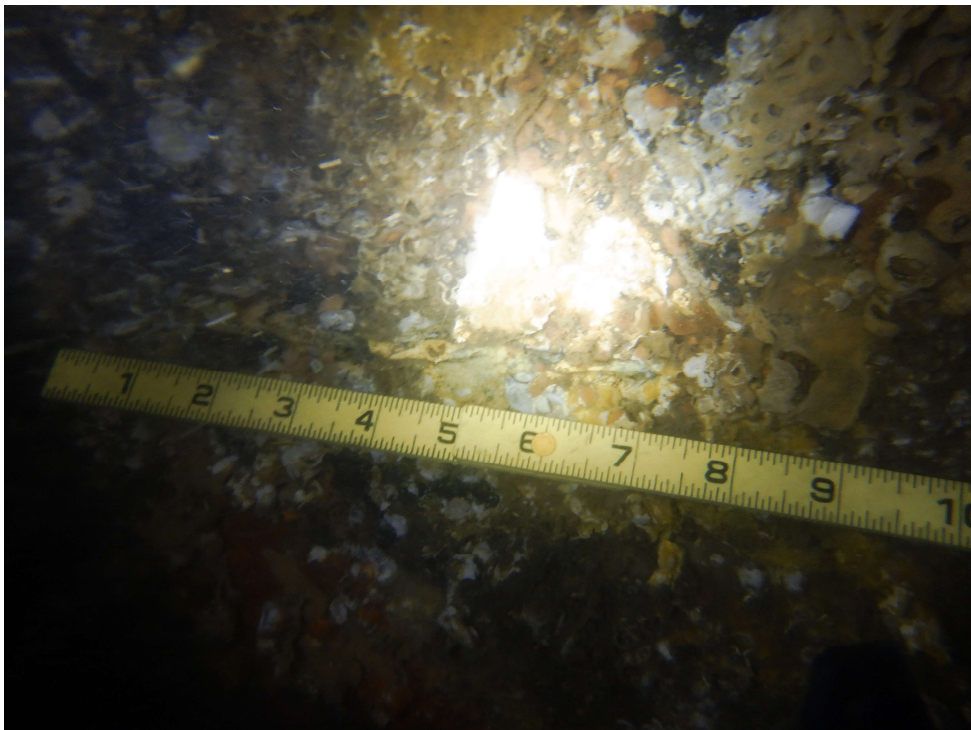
BSB125 Pile A – Spall in North Face, 25' below Water Line, Defect is Worst Case Defect (Looking Southwest)
